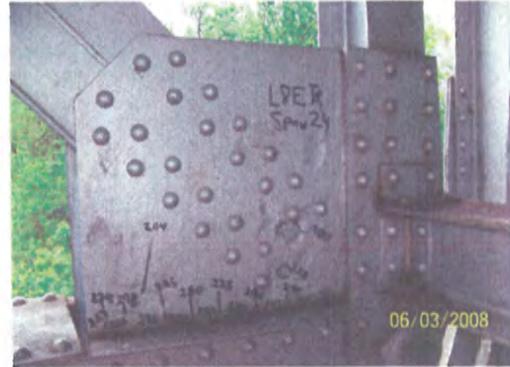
Span 22 West Truss L0 Inside Plate Hole
